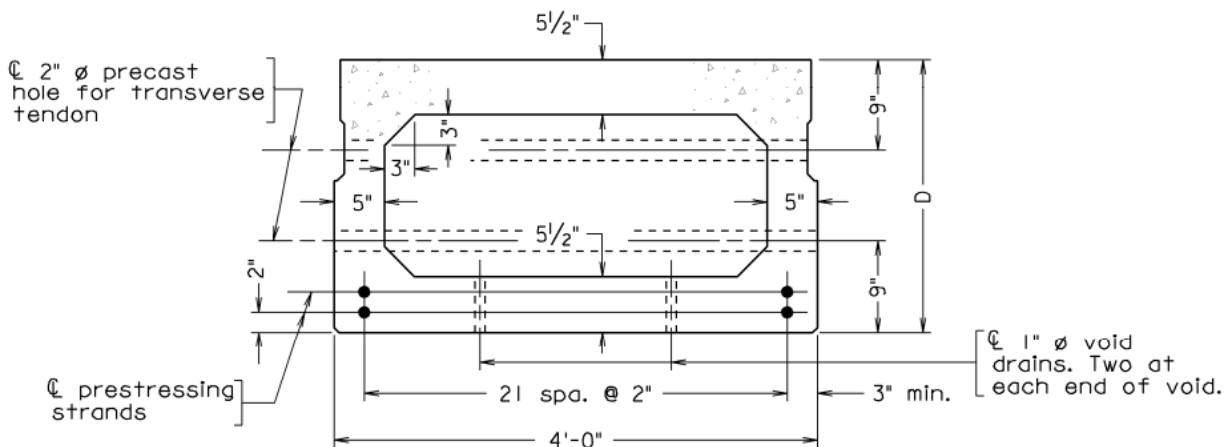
Typical 4 ft wide box beam section. VDOT (2008).
